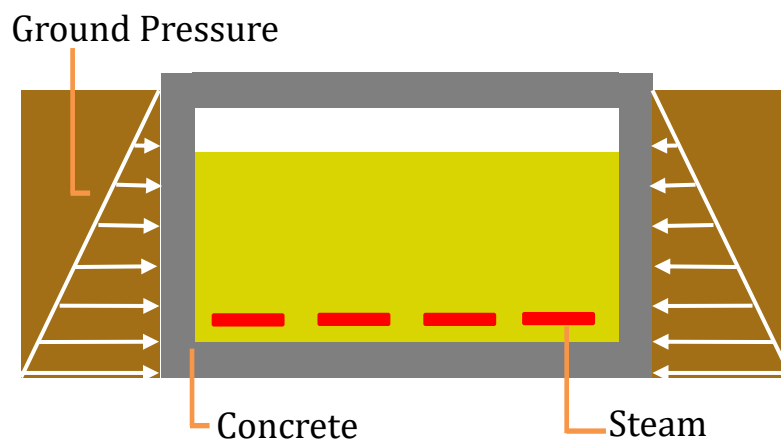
Schematic sectional view typical sulfur pit structure
